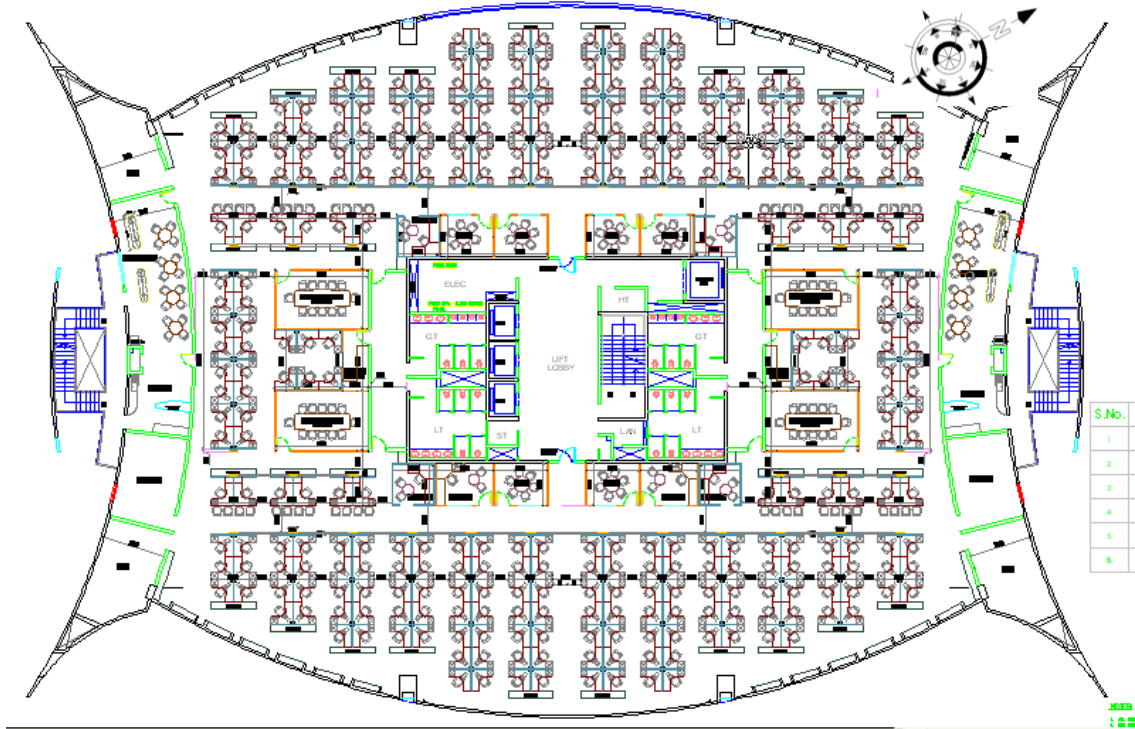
Plan of INFOTECH Building (typical open office plan)
